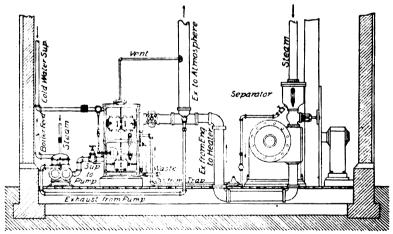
Method of Making Connections when Only a Portion of Exhaust from Engine is Allowed to Enter.
